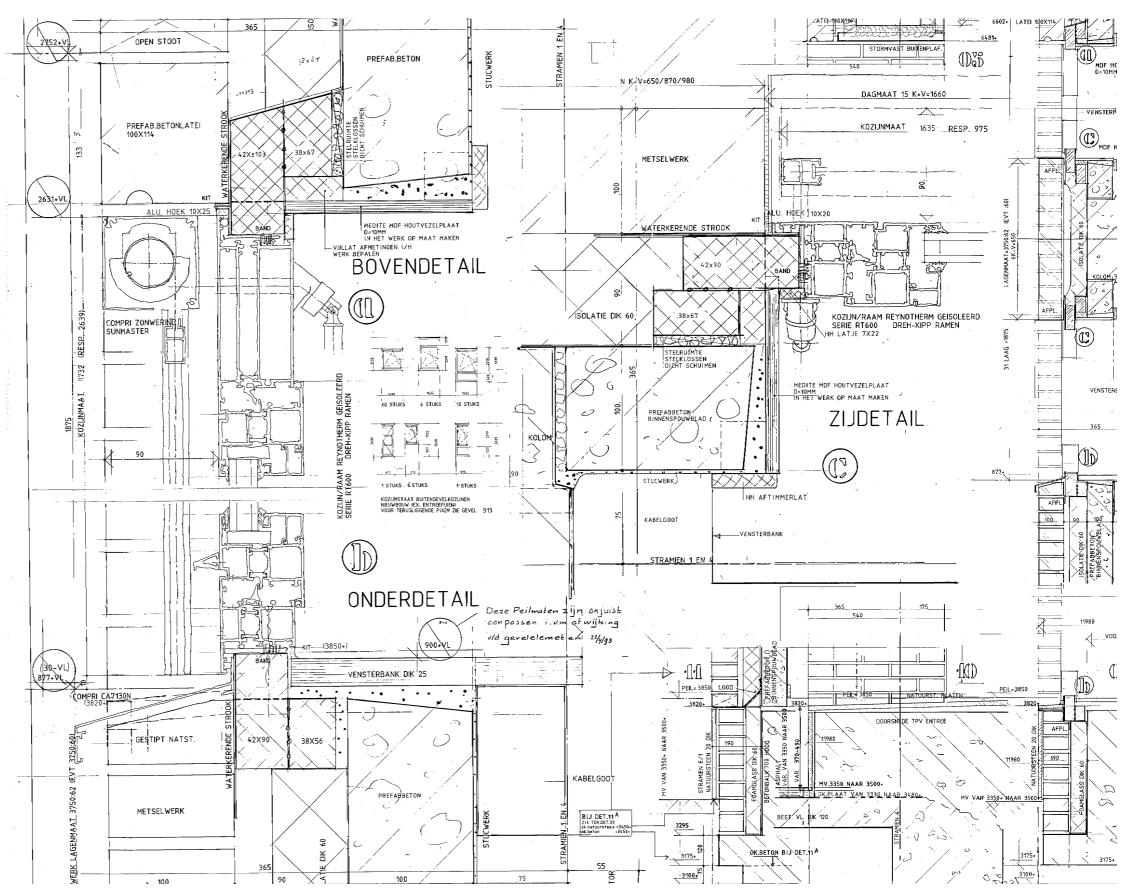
Details of the 1994 windows (Gemeentewerken Rotterdam, n.d.)
